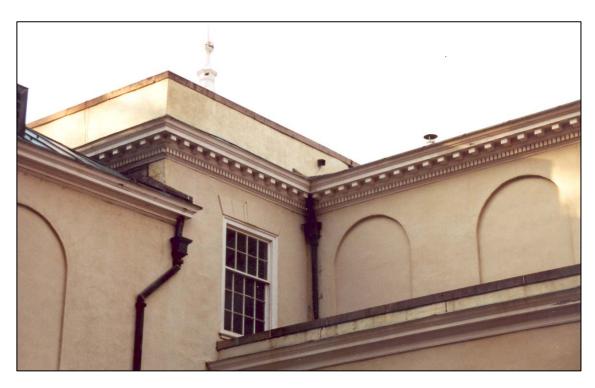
Morristown Museum Building: junction of north and east elevations, detail showing eaves (2001).
